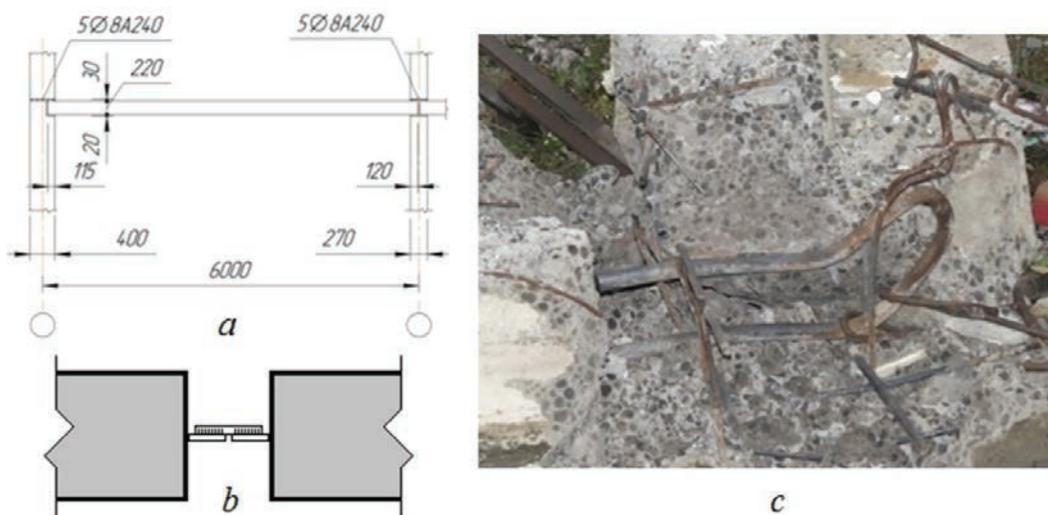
The constructive solution of ties of panel building series 1-115, where has been an emergency destruction: a) - the scheme of leaning of bearing hollow-core floor slab on the load-bearing walls of the building; b) – the scheme of welded steel cargo sling loop between the panels of bearing walls; c) - cargo sling loop in a damaged lightweight aggregate wall panel
